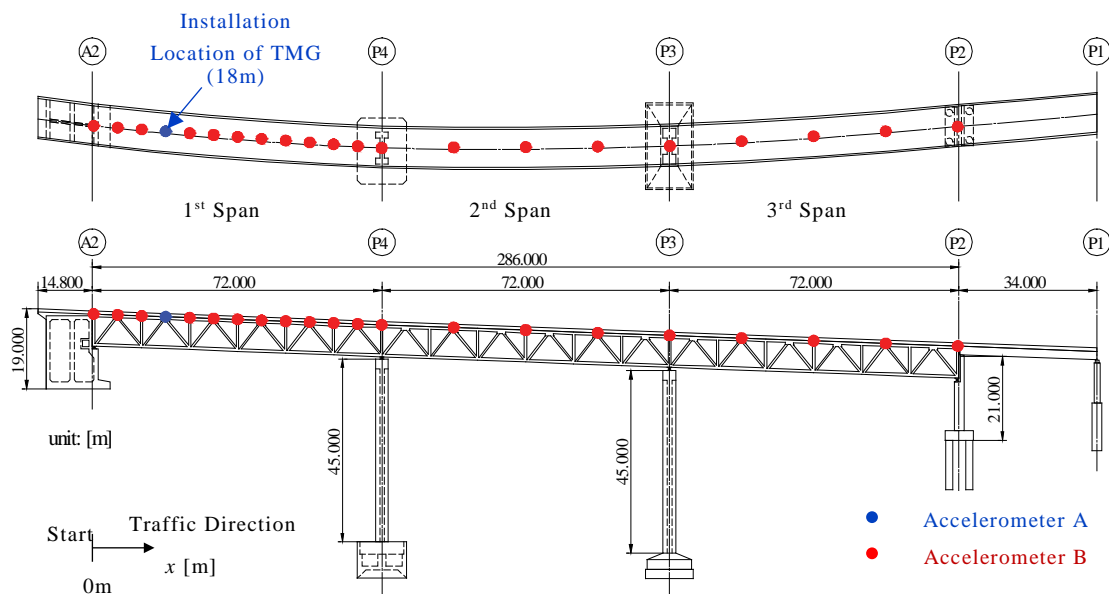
Trial bridge and installation location of TMG and accelerometers
